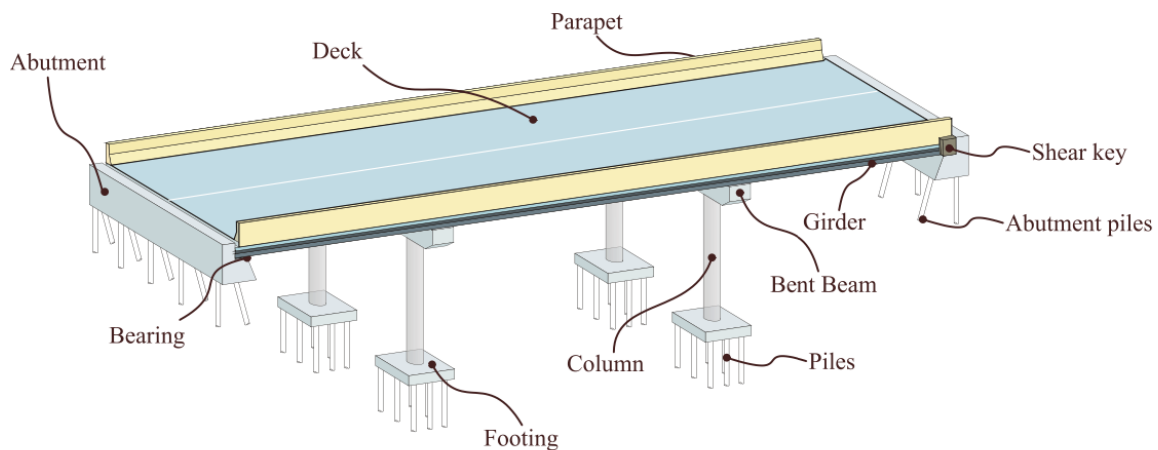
Typical highway concrete bridge components (Mangalathu, 2017)
